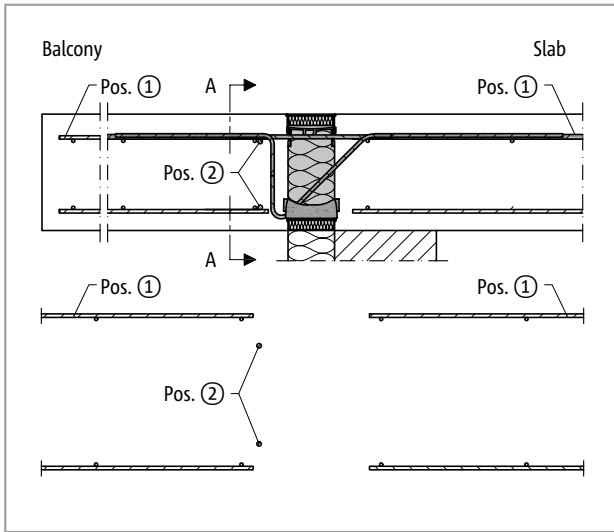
Schöck Isokorb® T type K-M1 to M11: On-site reinforcement with direct support
